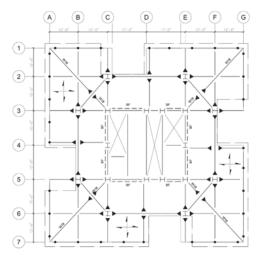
Typical structural steel framing with cross-laminated timber floor (Source: Guy Nordenson and Associates)
